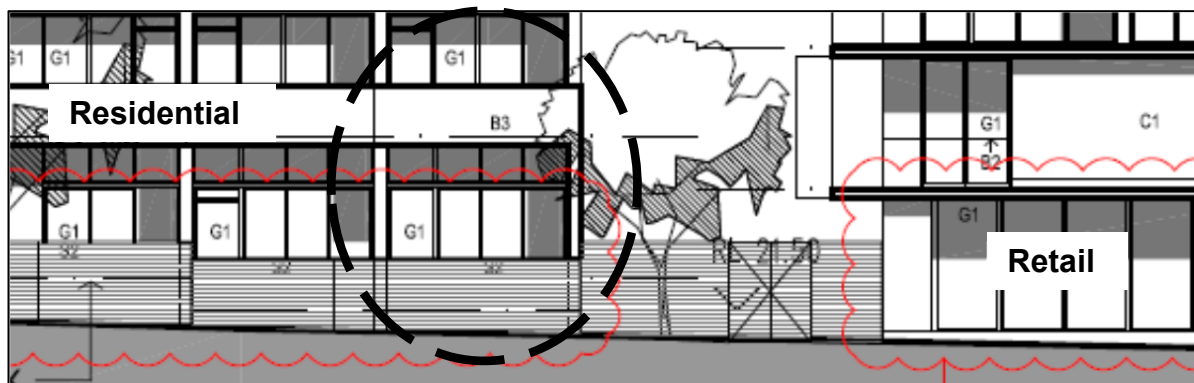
The proposed retail tenancy in Building A2 (circled) as viewed from Lamond Lane and Mary O’Brien Reserve
